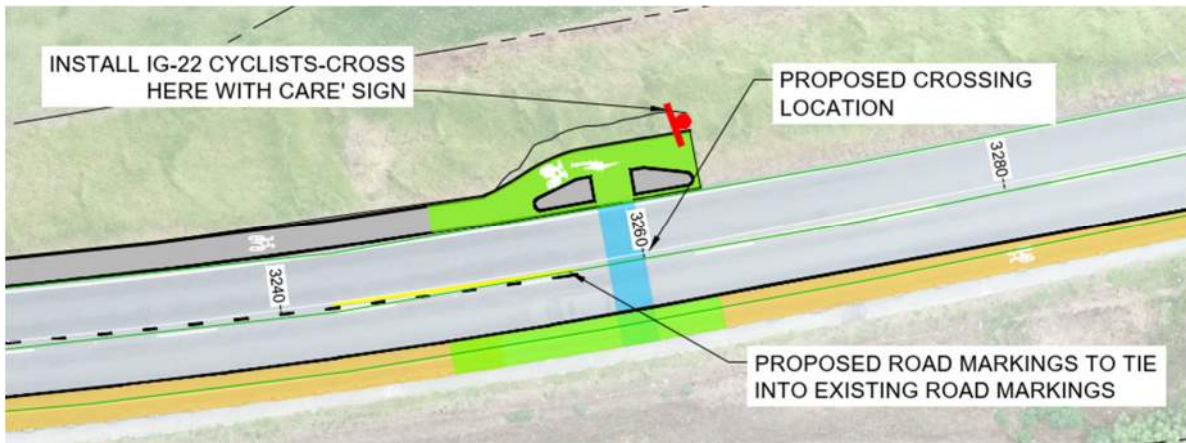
Proposed plan of the crossing point on Marsden Point Road (RP 3260m)
